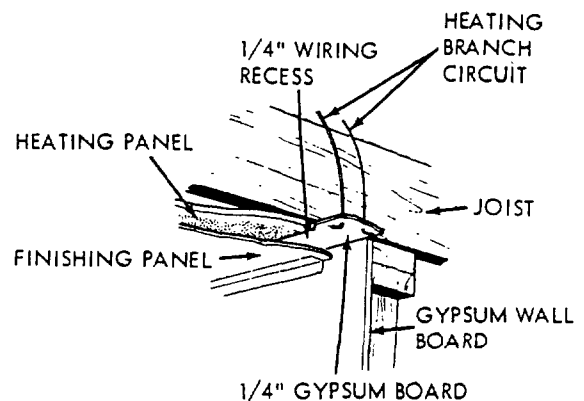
Wiring Recess Construction (1/4" Depth)
